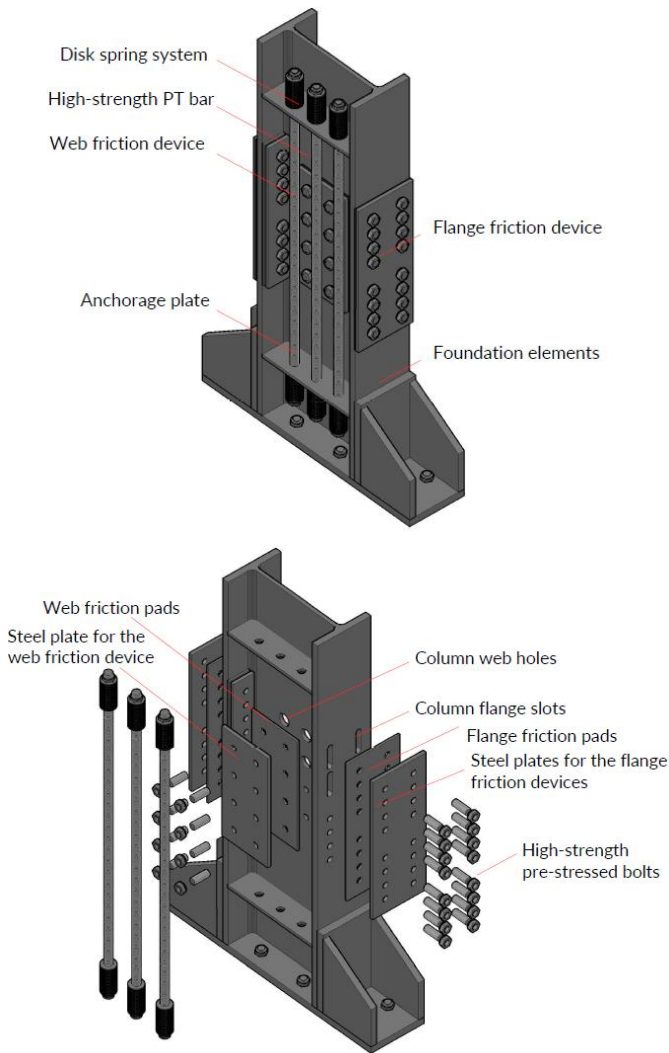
(a) 3D view; (b) 3D exploded view of the self-centring column base connection
